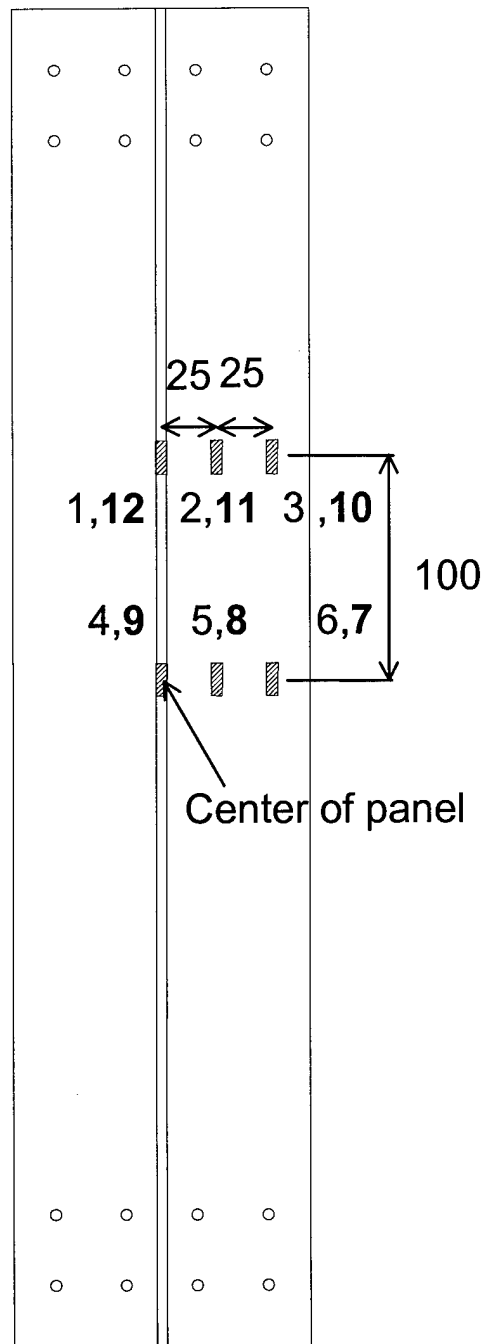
Location of strain gages on narrow panel N1 (all dimensions in mm), strain gages in bold print are on flat skin side of panel.
